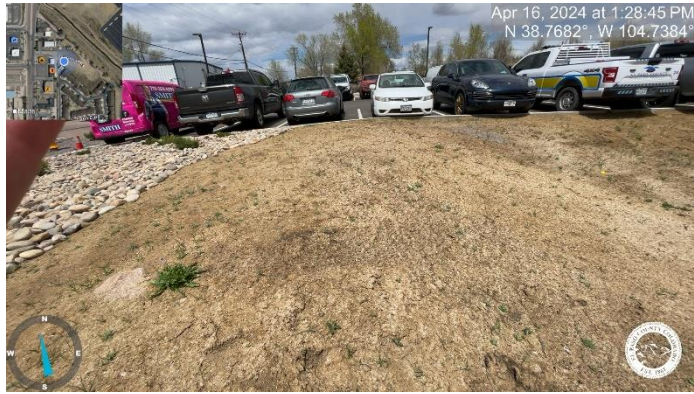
Pond: Properly install the emergency overflow spillway. Spillway crest elevation should be 5850.00 with trapezoidal shape (12' Weir width, with 4:1 slopes of 1' on either side). Reference sheet C3.2 of the Construction Documents.
